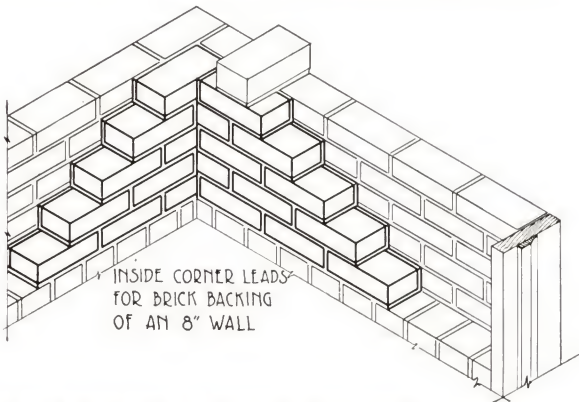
Inside corner of an 8-inch brick wall laid up in common bond.
